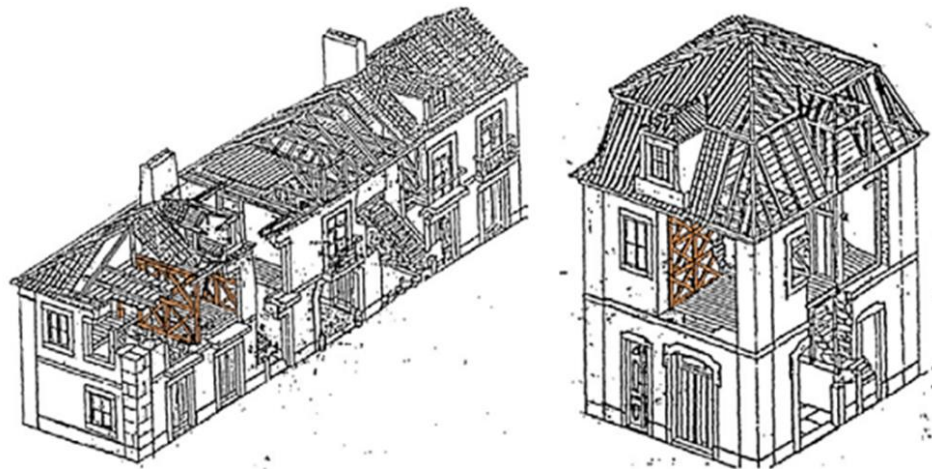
Two storey buildings built after the 1755 earthquake with detailing of the roof structure and of the frontal walls. (Adapted from Mascarenhas, 2004)
